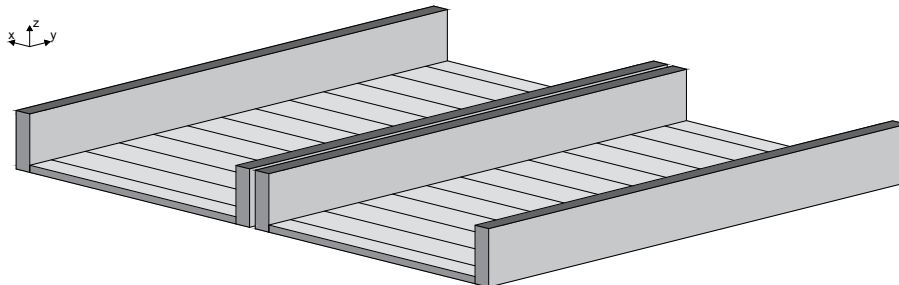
Dimensions for a double trough bridge design with a side girder height of $h_t = 4.0$ m
